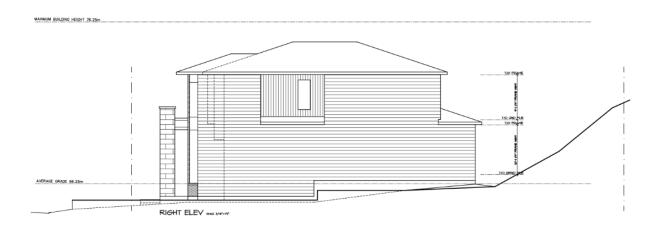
Right Elevation, prepared by David Bekkers M.A.A.T.O
